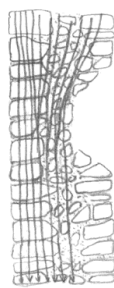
Building phase of a R.C. tie beam, (Source: POLIMI).
